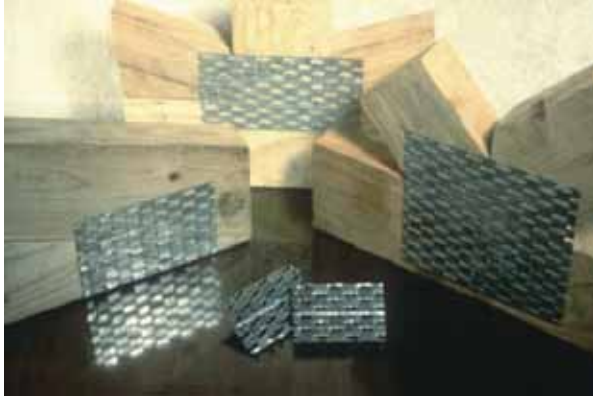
Gusset plates used to connect wooden truss members. (Photo courtesy of Kirk Grundahl.)
